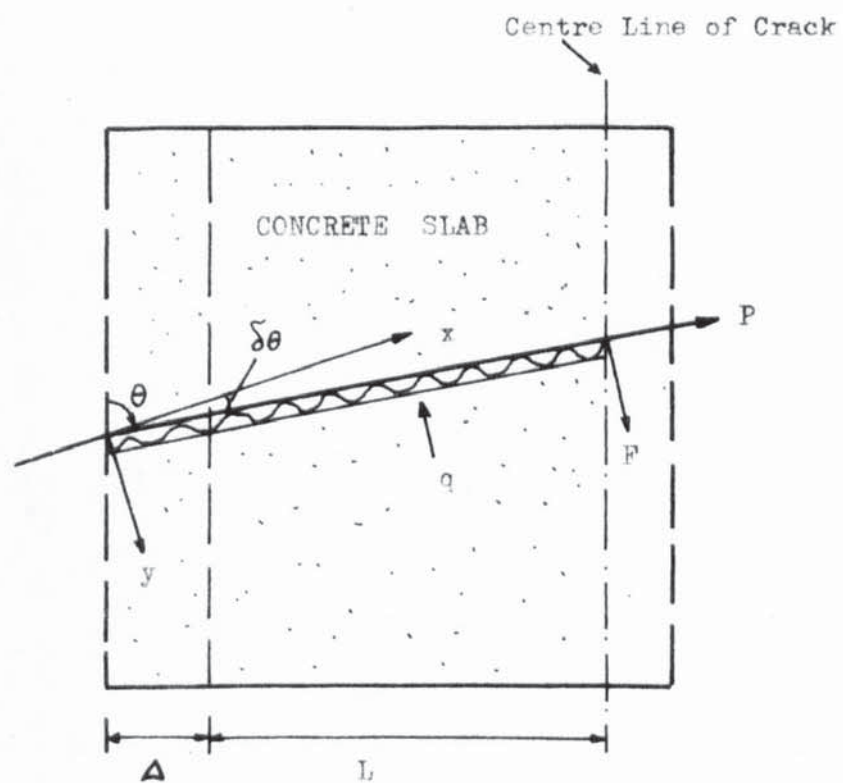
GEOMETRY OF BAR IN CONCRETE CRACK AND FORCES ON BAR
